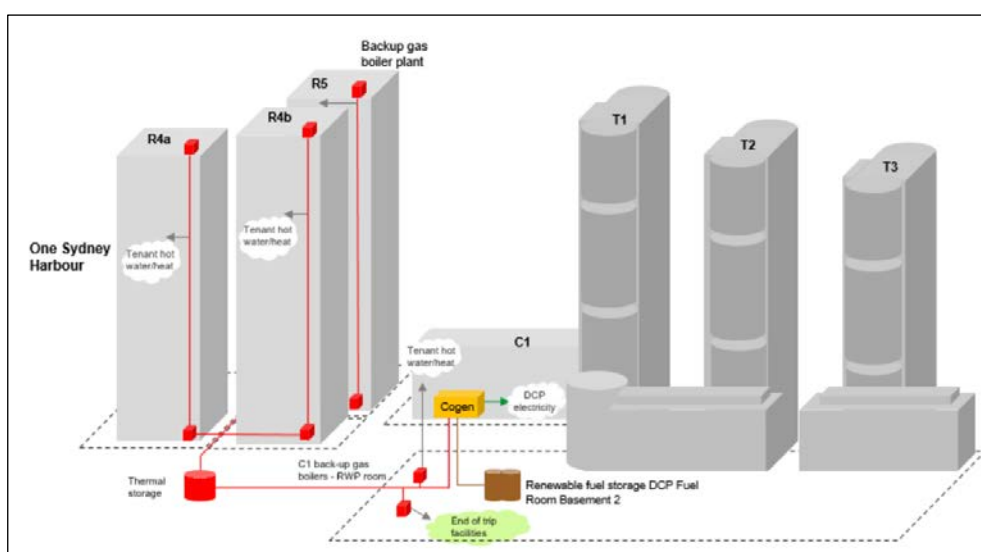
| The proposed power and heating distribution plan (Source: Applicant)
